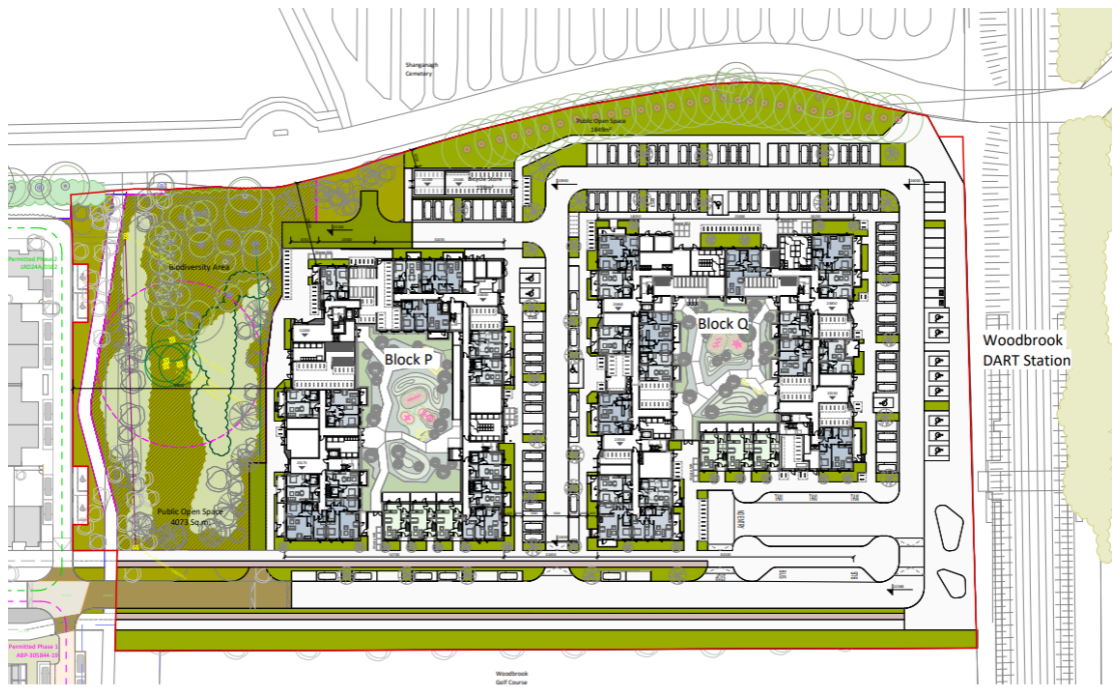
Proposed Site Layout, prepared by O'Mahony Pike Architects.
